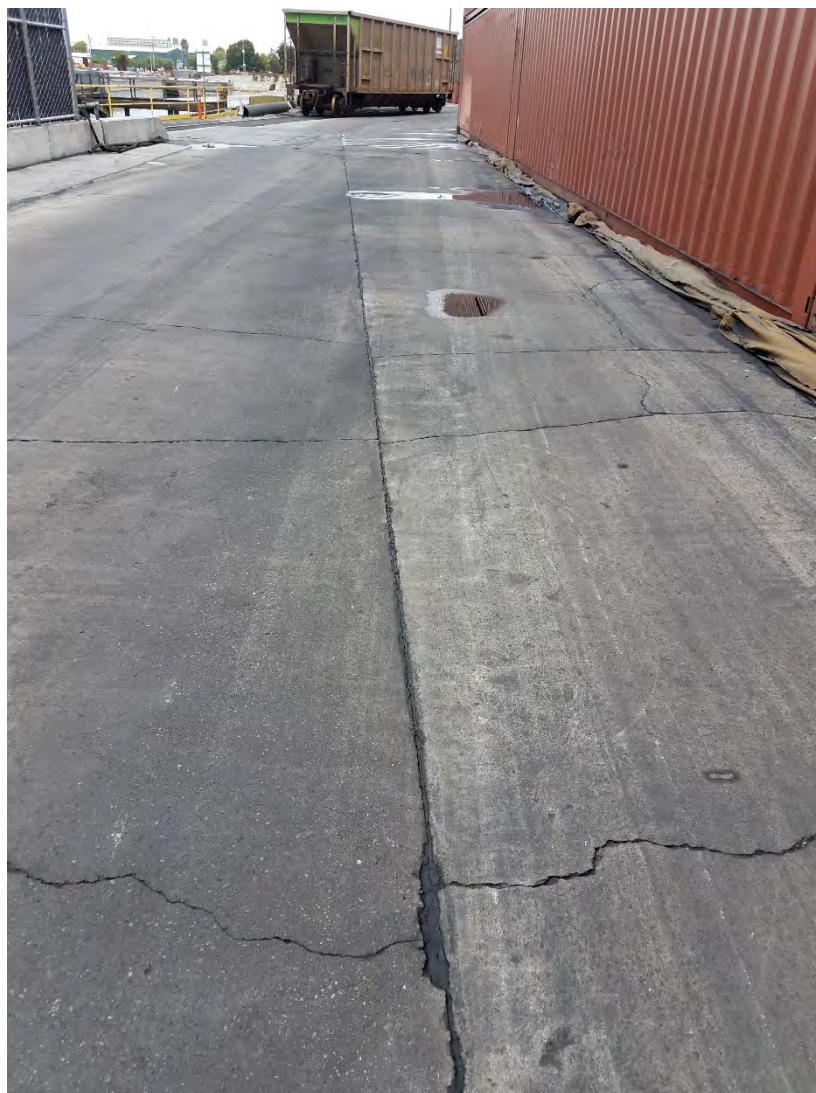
Looking north toward interceptor SW-4: seams and areas of surficial cracking. No change noted from previous year.
